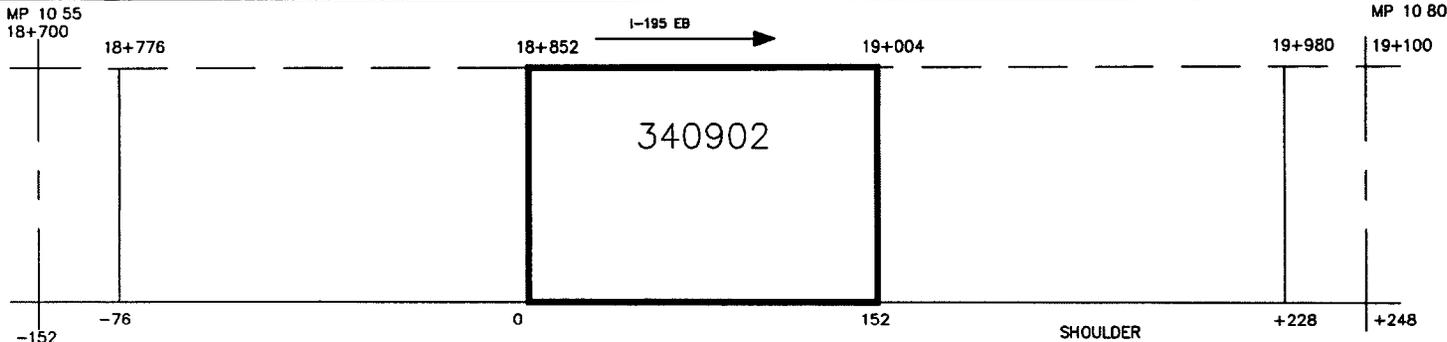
Materials Sampling and Testing Plan SPS-9A Section 340902
